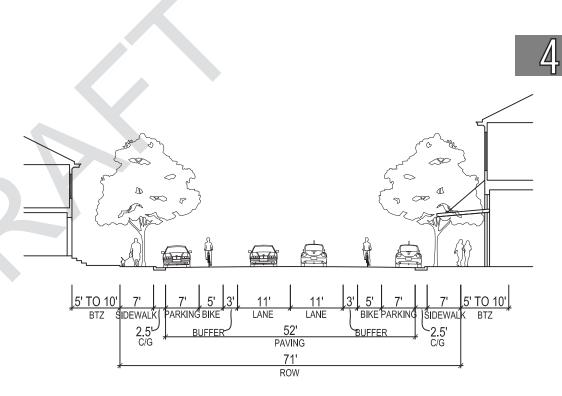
Street Type 3: Neighborhood Street Cross Section
